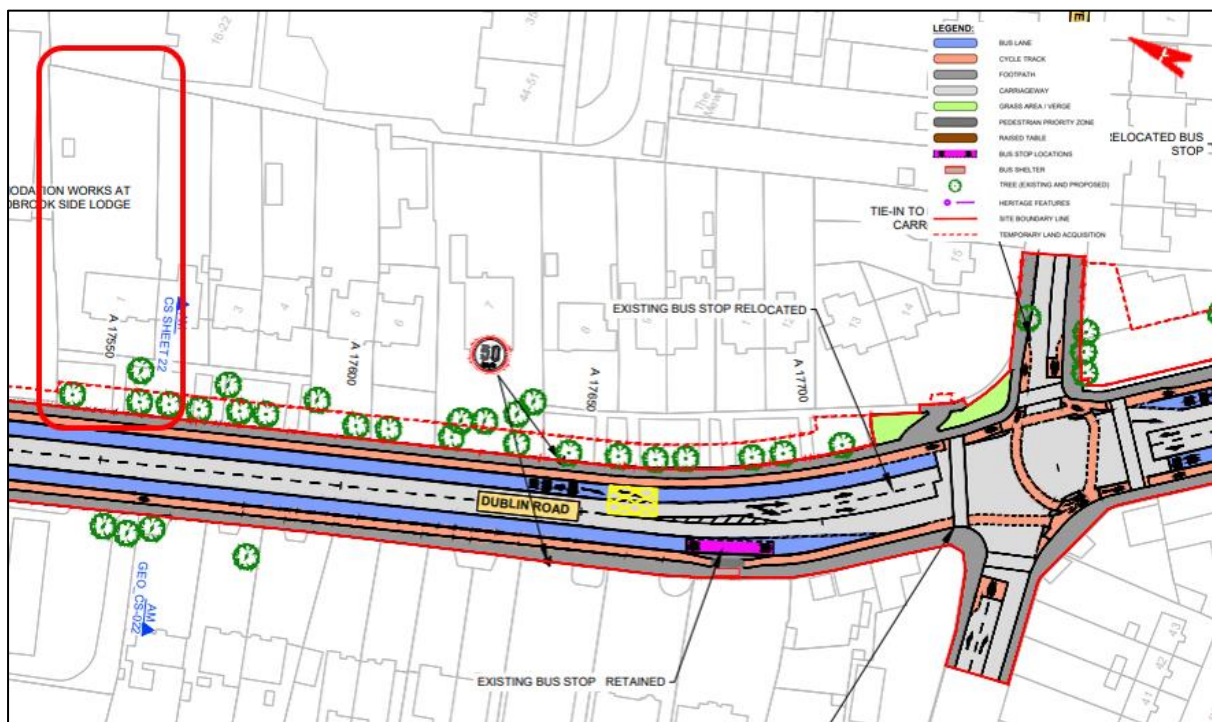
Extract from General Arrangement Drawing at Dublin Road (Sheet 50)
